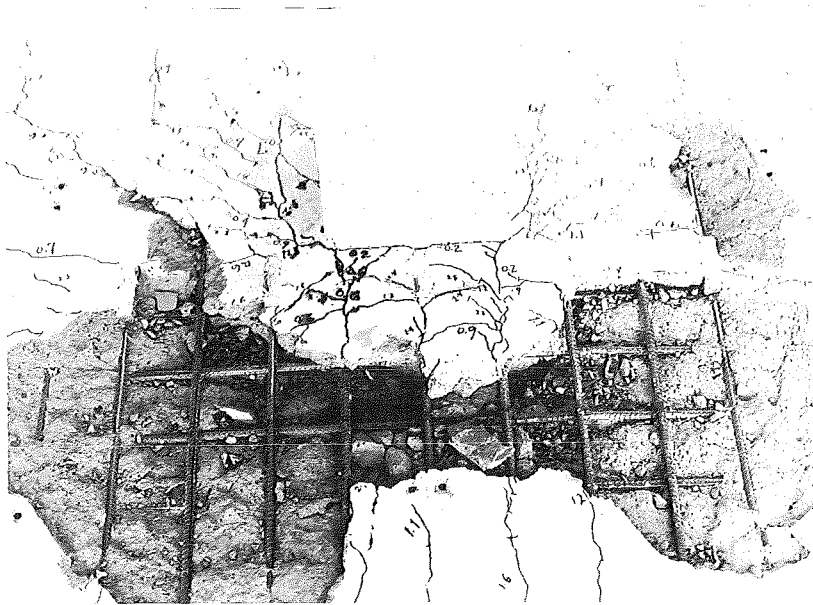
VIEW OF SPECIMEN 2 AFTER REMOVAL
